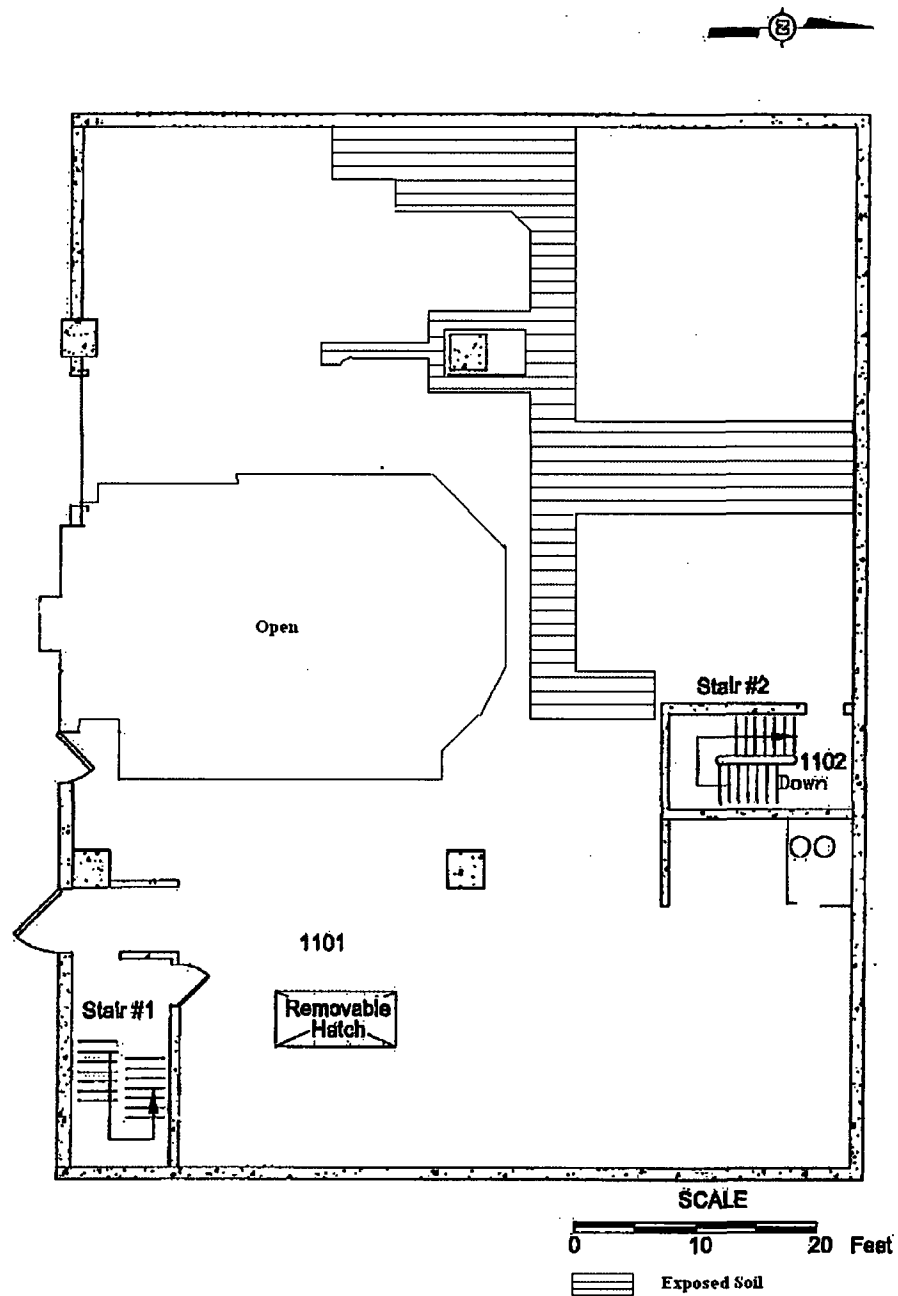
Floor Plan of the Ford Nuclear Reactor First Floor
